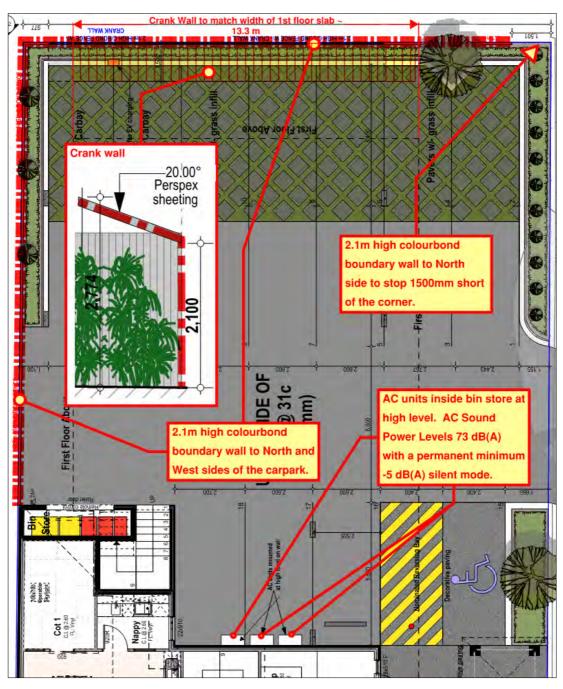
GROUND FLOOR NORTH – Carpark Noise Barriers
